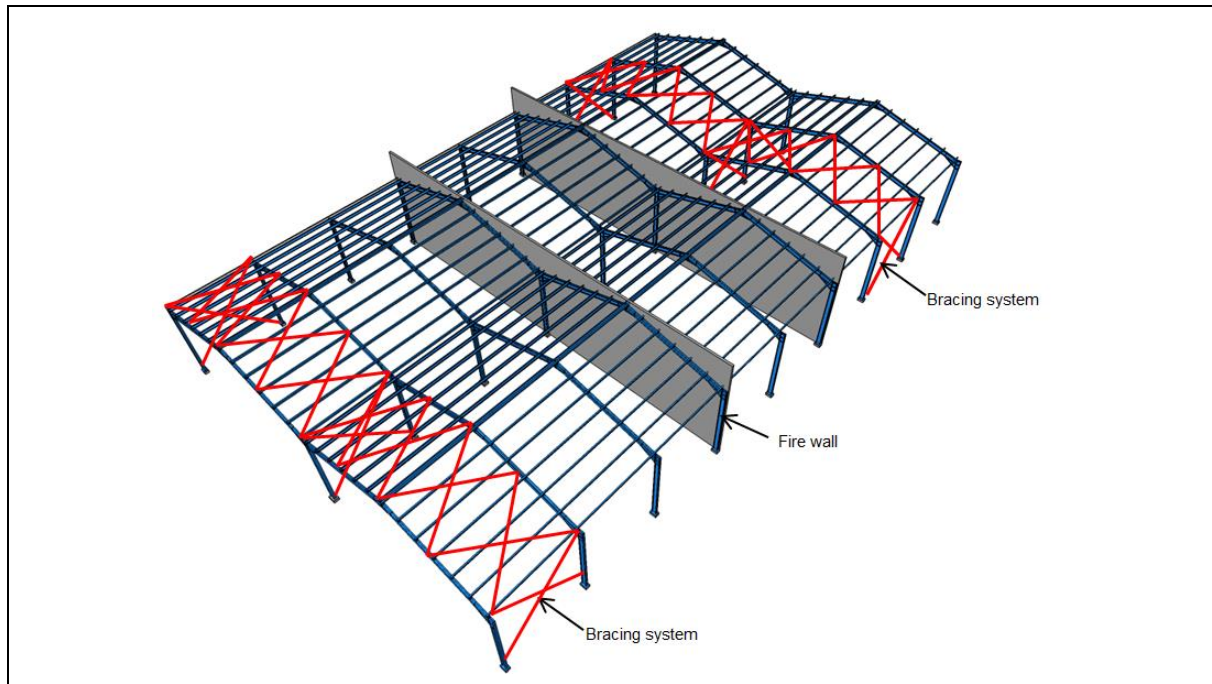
Recommendations for bracing systems – wall parallel to portal frames
